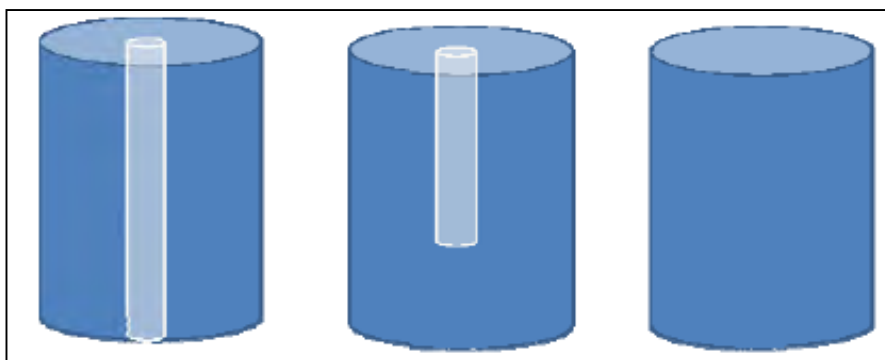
Detail arrangement for soft clay specimen reinforced with singular bottom ash column (Hasan *et al.*, 2011)
